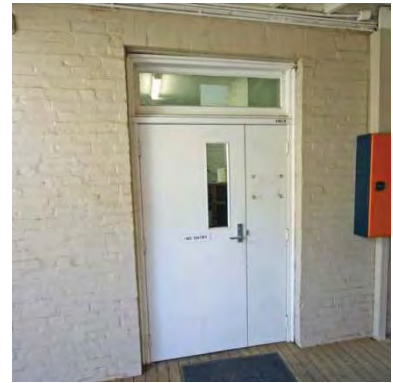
1926 additions exterior north face showing window cut into face c1936
